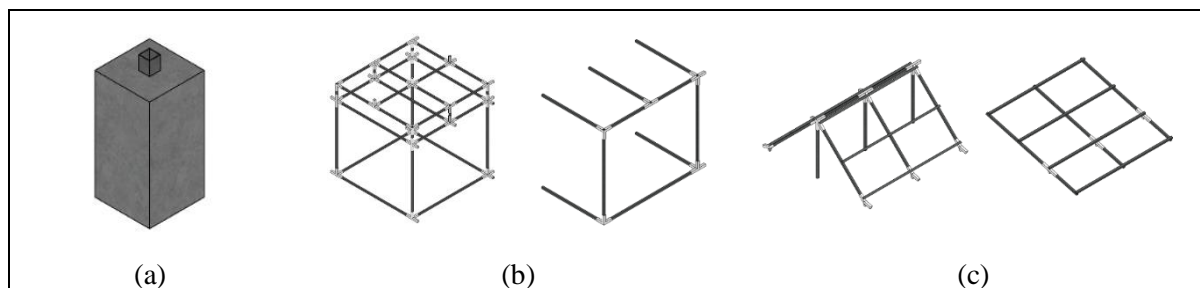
Structural system on module ((a) Foundation; (b) Columns and beams; (c) Roof frame)
